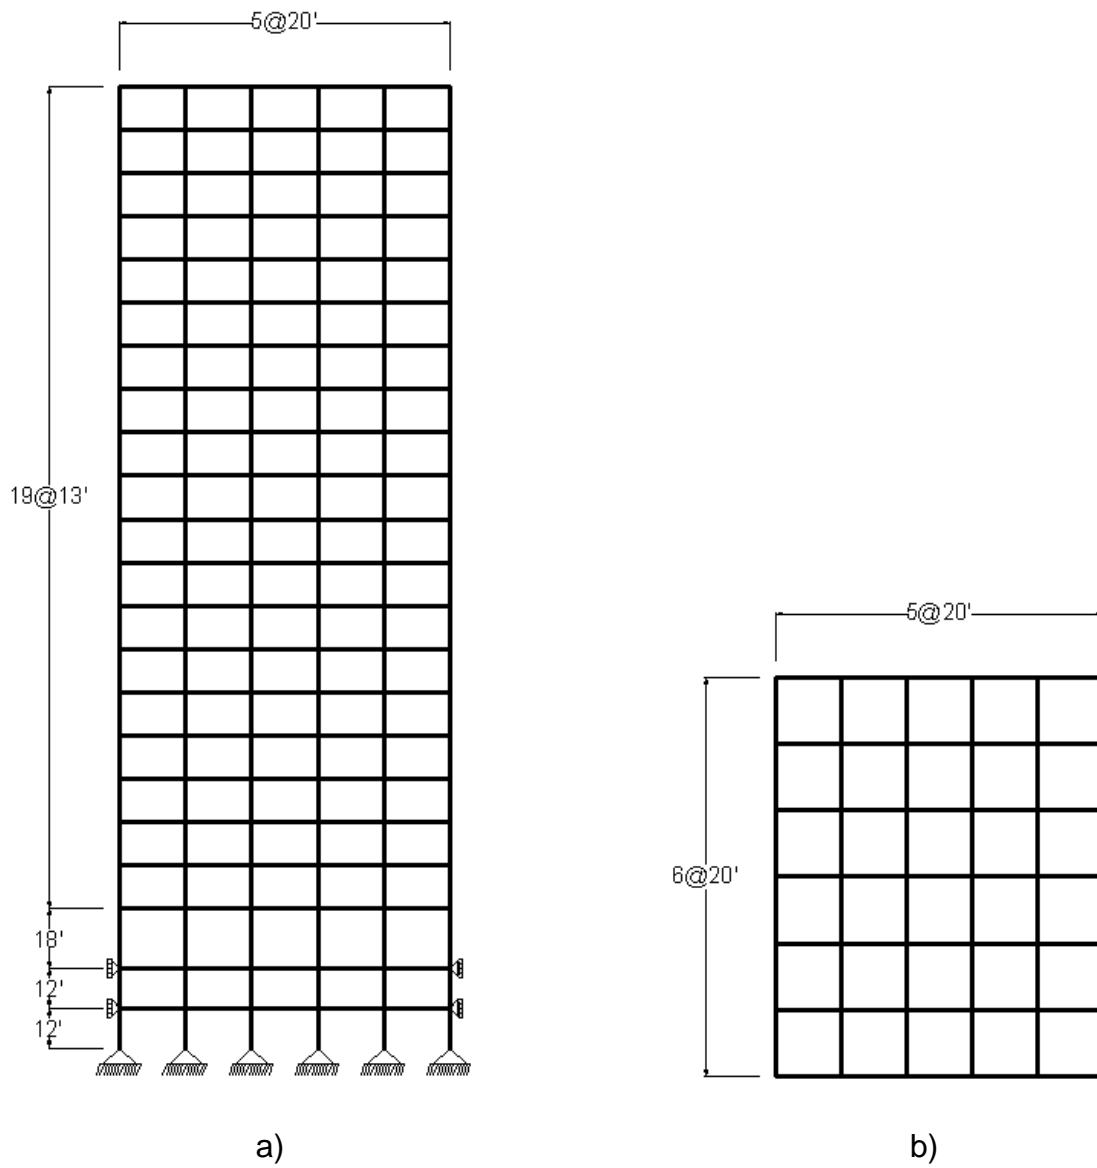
20-Story SAC Frame: a) Elevation View, b) Plan View
